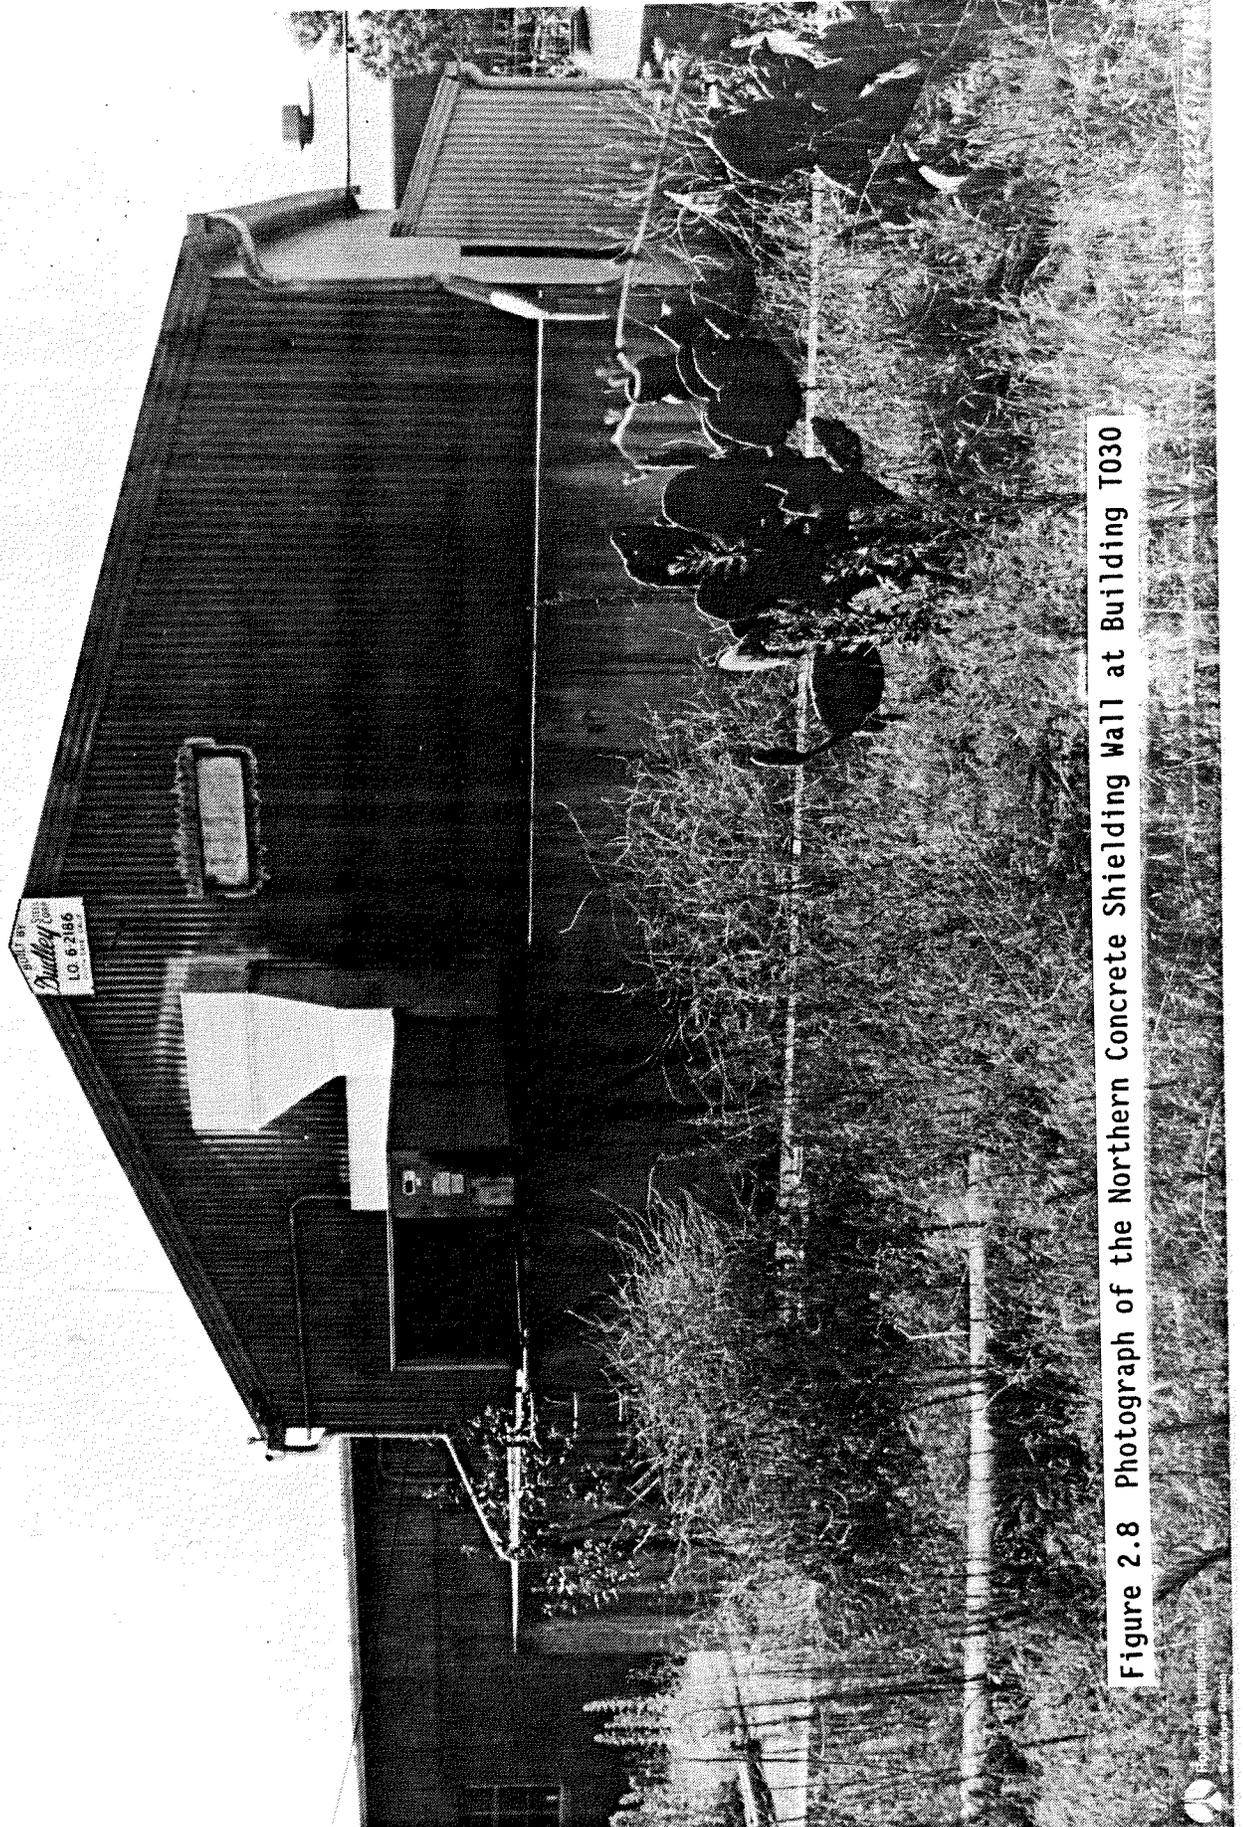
Photograph of the Northern Concrete Shielding Wall at Building T030
